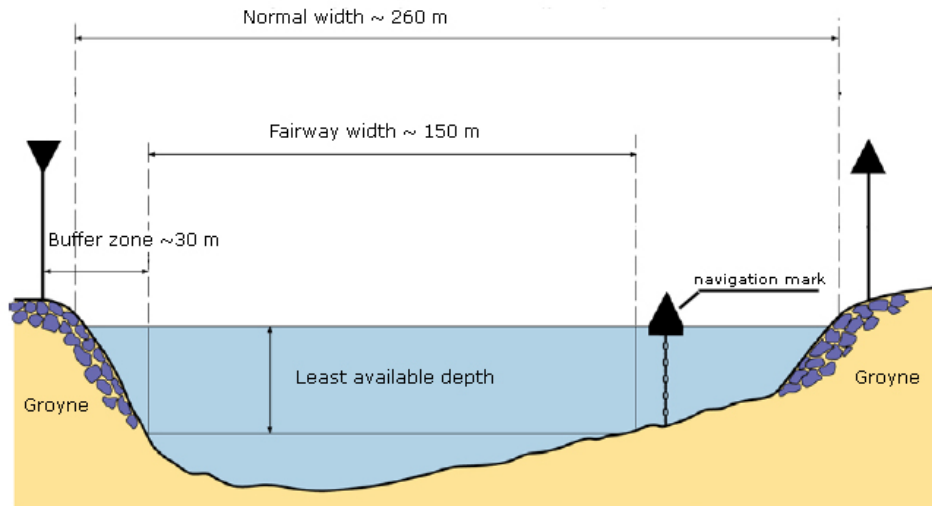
Cross-section of a typical Waal river channel. Adapted from Rijkswaterstaat (2007).
